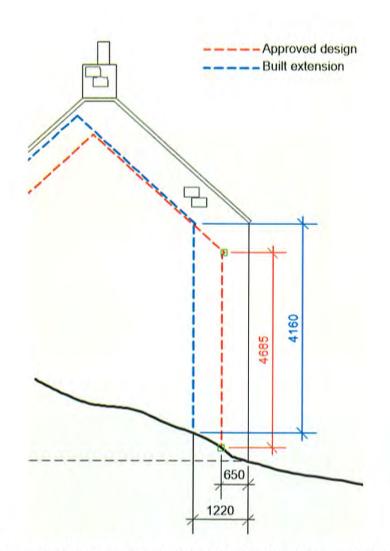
Sketch (not to scale) – Sketch showing that when the front façade of the extension was moved back by 570mm, its relative height to the host building also increased, due to the gradient of the site. This was a genuine error during construction.
